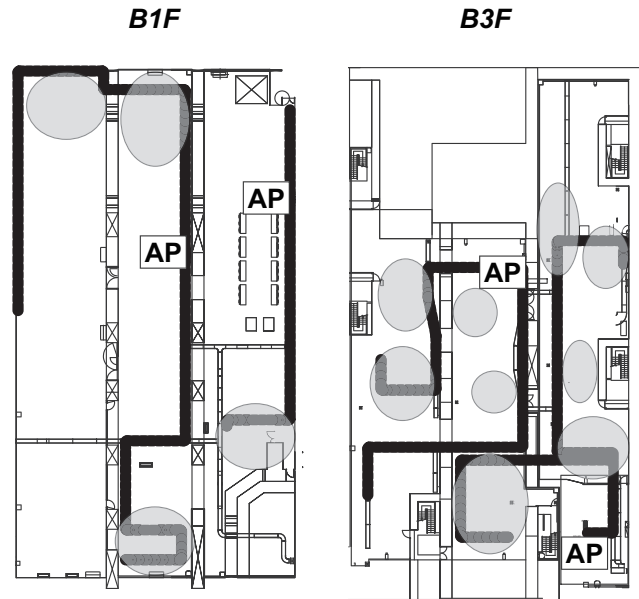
Wiring diagram for the B1F and B3F measurement rooms in the RIBF building.
